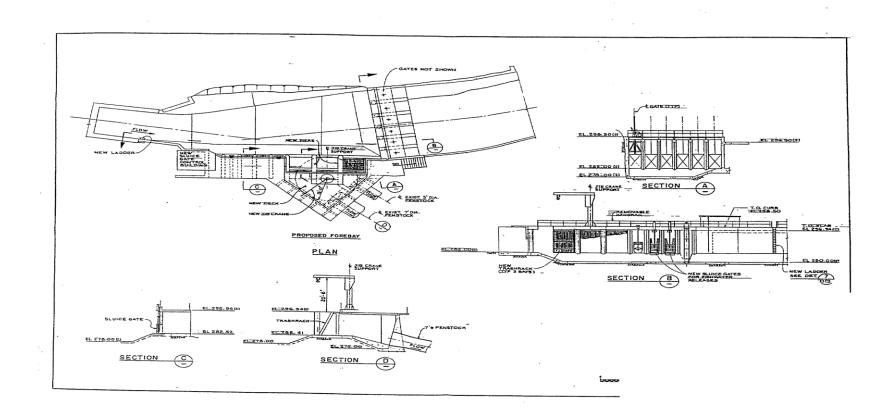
TID tunnel exit, forebay, and Upper Main Canal and powerhouse intakes.
